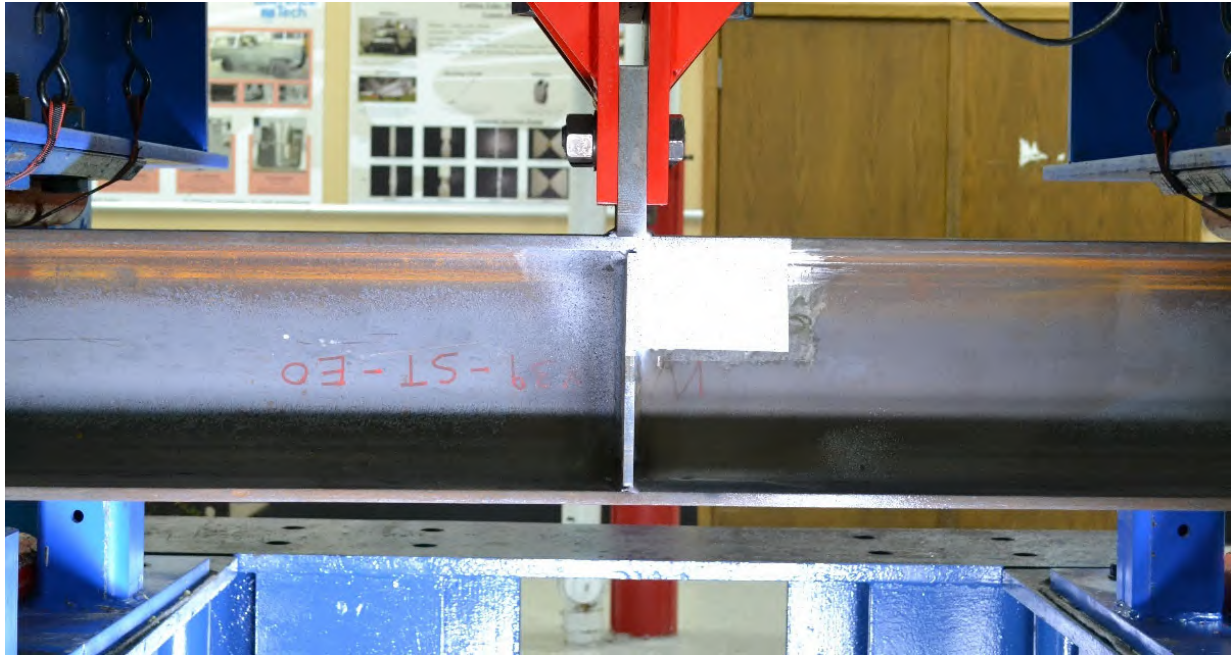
Bottom view of W10X39-ST-E2 after testing
